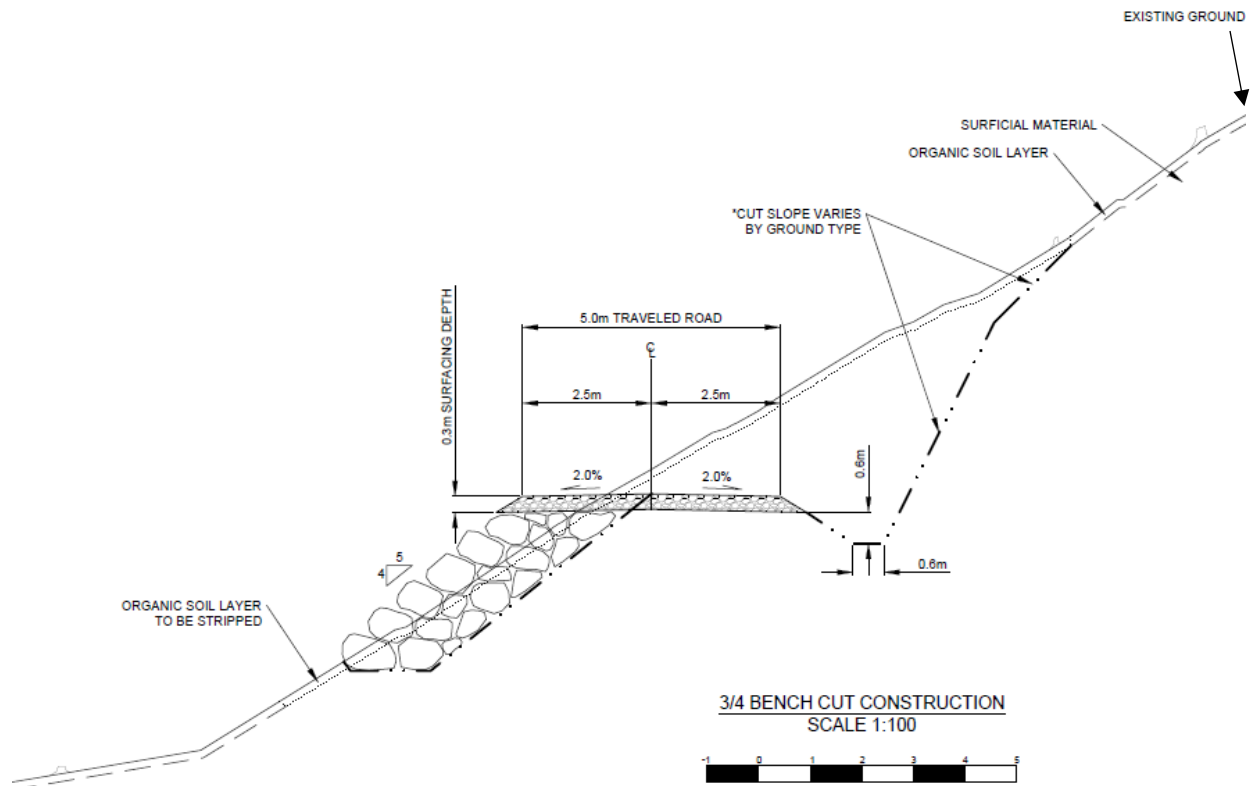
³/₄ Bench Cut Rock Fill Construction Typical
